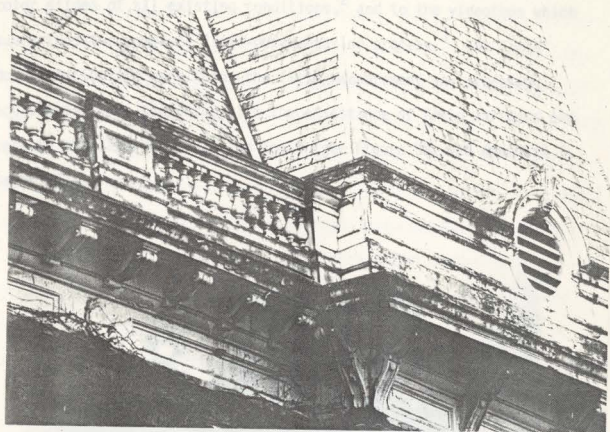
Existing Condition of North-Elevation Balustrade: 1988 View
